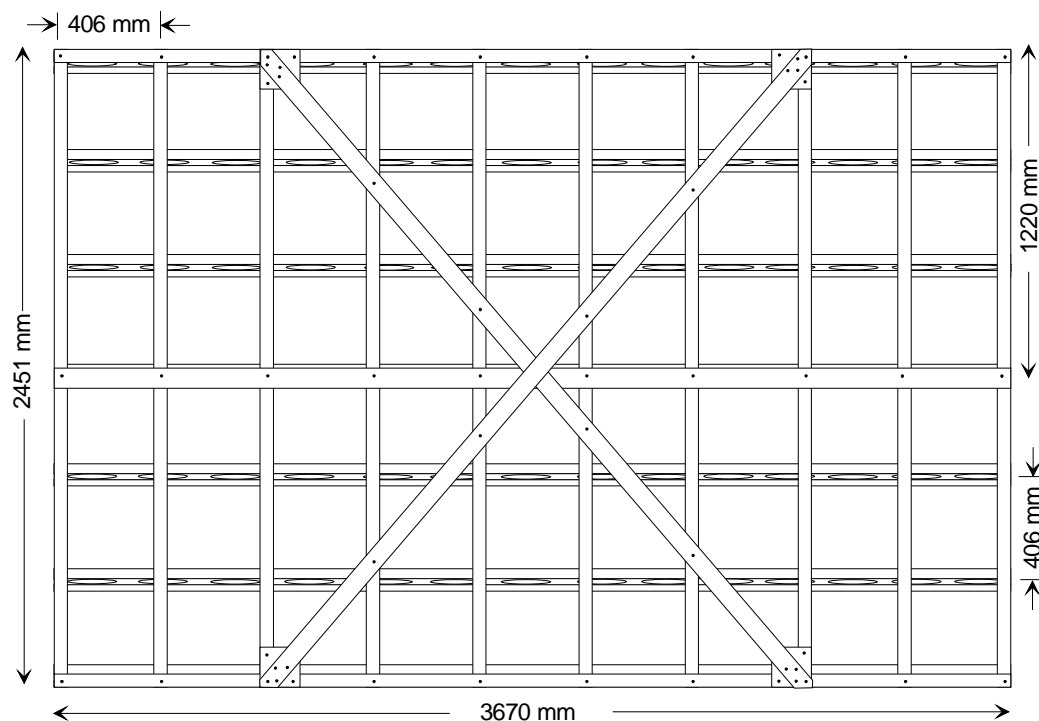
Sketch showing the location of the bridging and cross bracing used in steel-framed specimens TLA-99-129 and TLA-99-131. The bridging and cross bracing were 75 x 0.84 mm flat strap and were secured using 19 mm #8 low-profile self drilling screws. The cross bracing and bridging were located on the side of the wall having the direct attached gypsum board. Other construction elements are unchanged from the assembly shown in Figure A-1.
